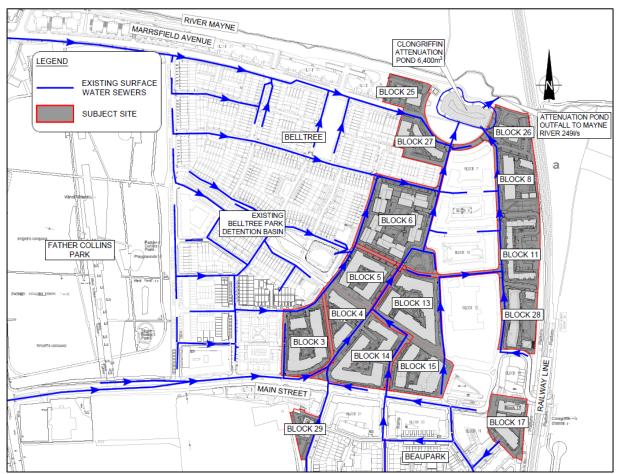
| Existing and Proposed Surface Water Drainage Layout
